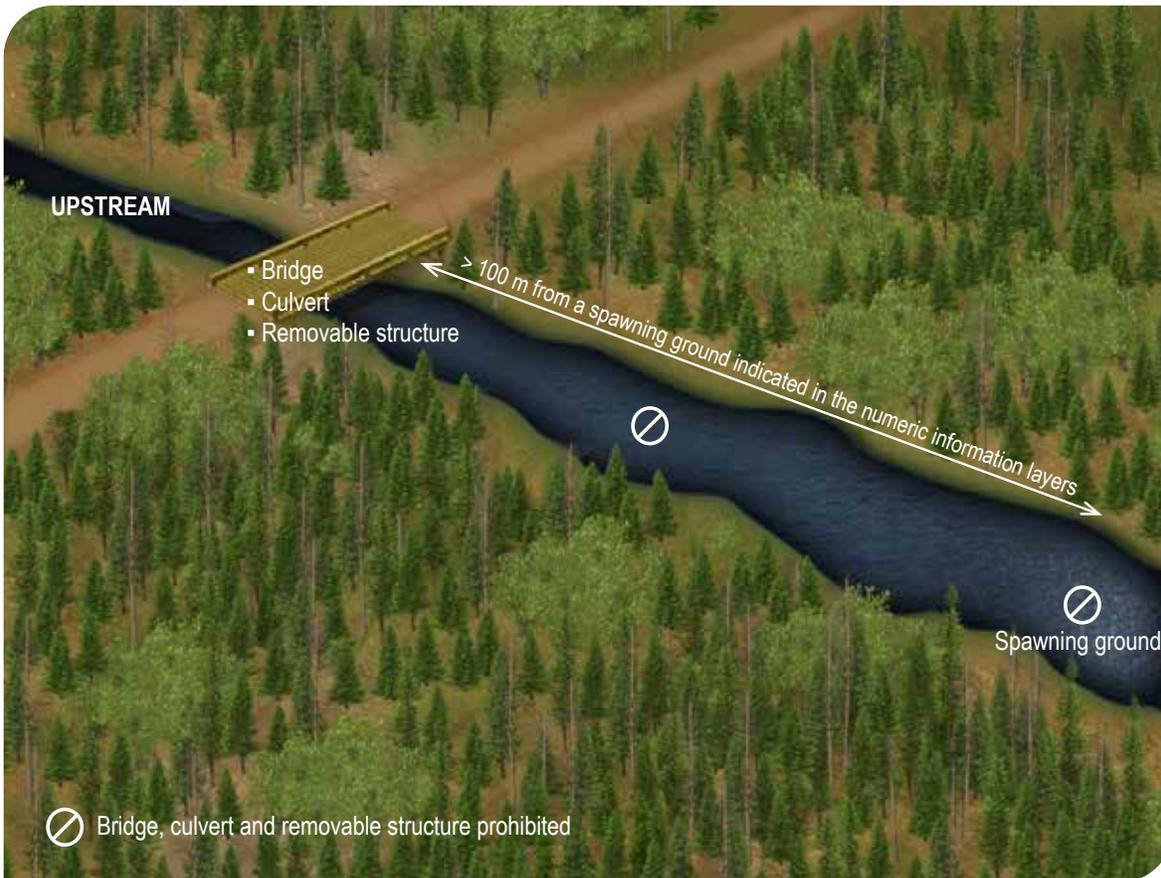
Distance between a spawning ground and a bridge, culvert or removable structure
